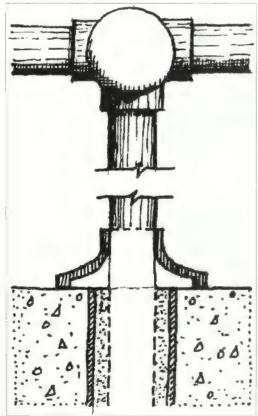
Cross-section, new railing installation. New guardrails and handrails should be attached by core drilling into the existing concrete and setting the rail in non-shrink epoxy grout. An escutcheon plate matching the historic plates should be fitted around the vertical member before the rail is set and lowered into position to cover the epoxy interface (Freeman et al., Seacoast Fortifications Preservation Manual, 160).
